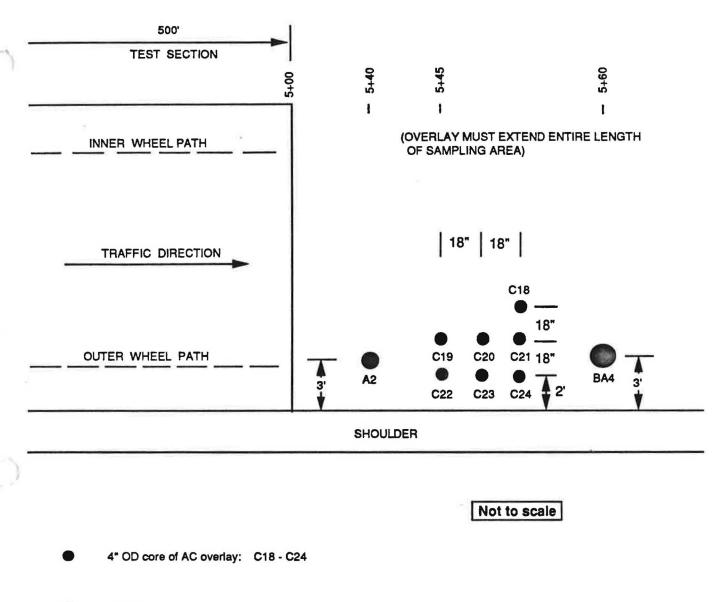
<u>After Overlay</u> Sampling Point Locations Before Test Section, GPS-7 Asphalt Concrete Overlay Over Jointed Concrete Pavement (Alternative Sampling Plans) - Case 2
